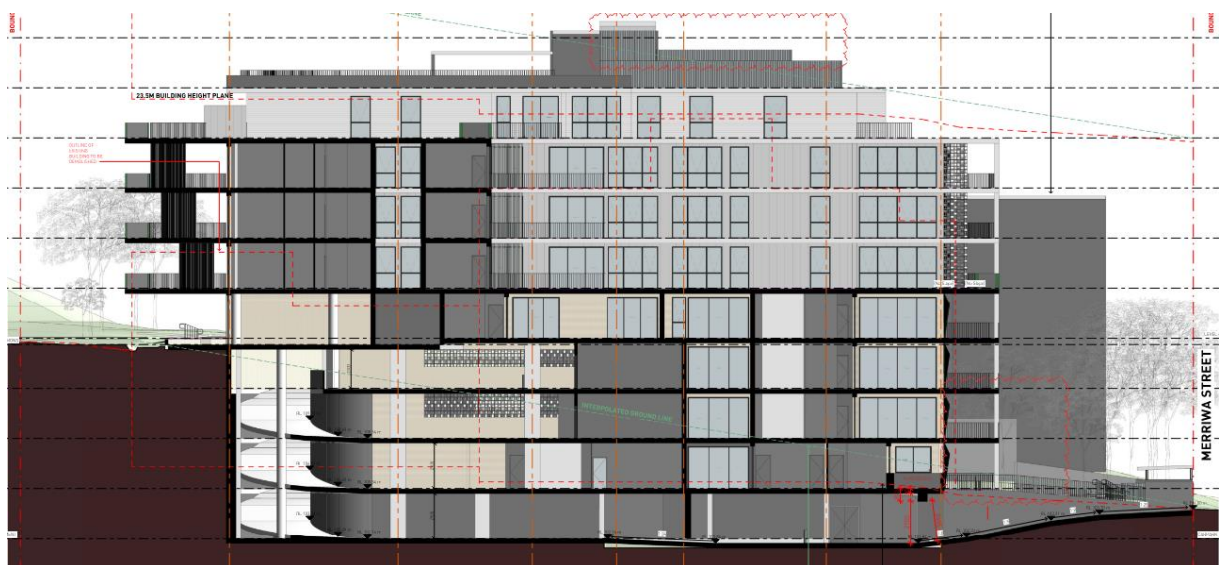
An extract of the proposed section plans, showing the proposed development's relation to the sloped topography (both existing and extrapolated) of the site.
